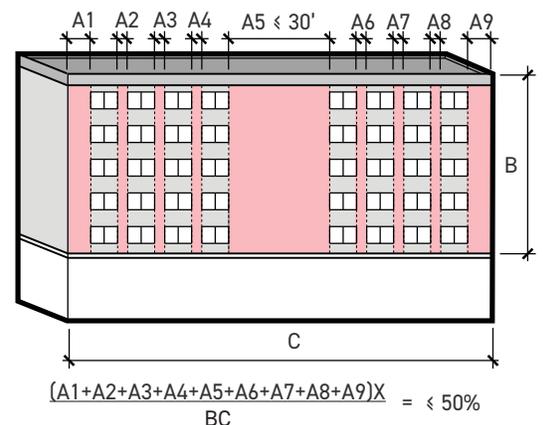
UPPER FLOOR BLANK WALLS CALCULATION
